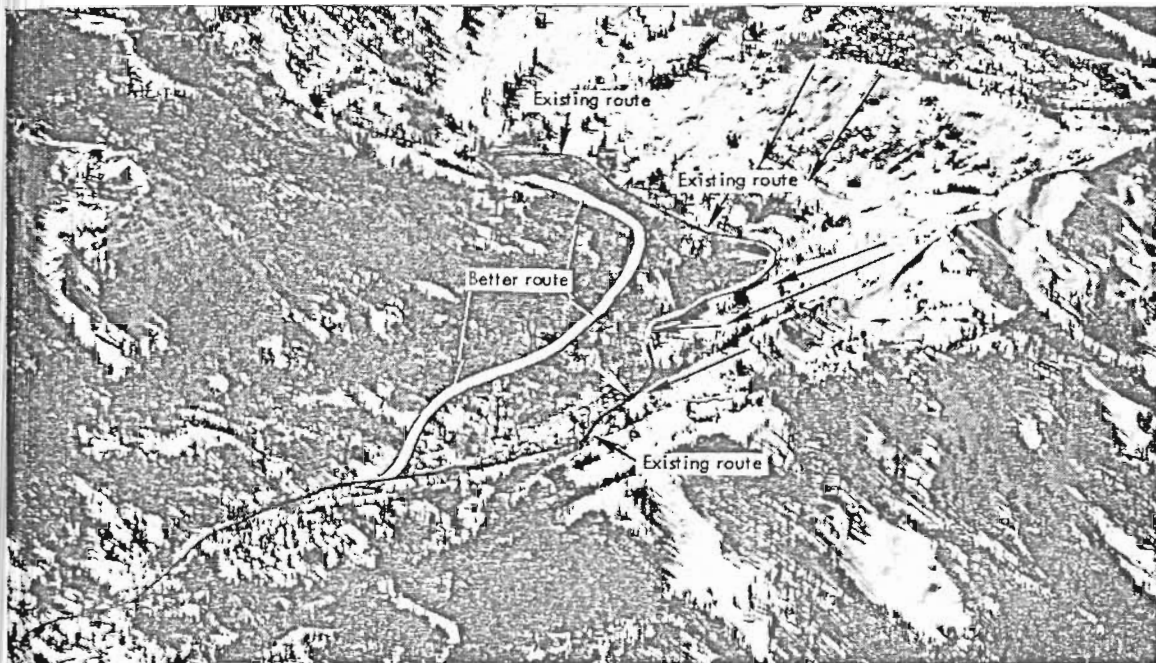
A ski area access road menaced by avalanches. The road could have been installed on the south side of the canyon where an avalanche-free route is available, but the land was devoted, instead, to subdivision.
